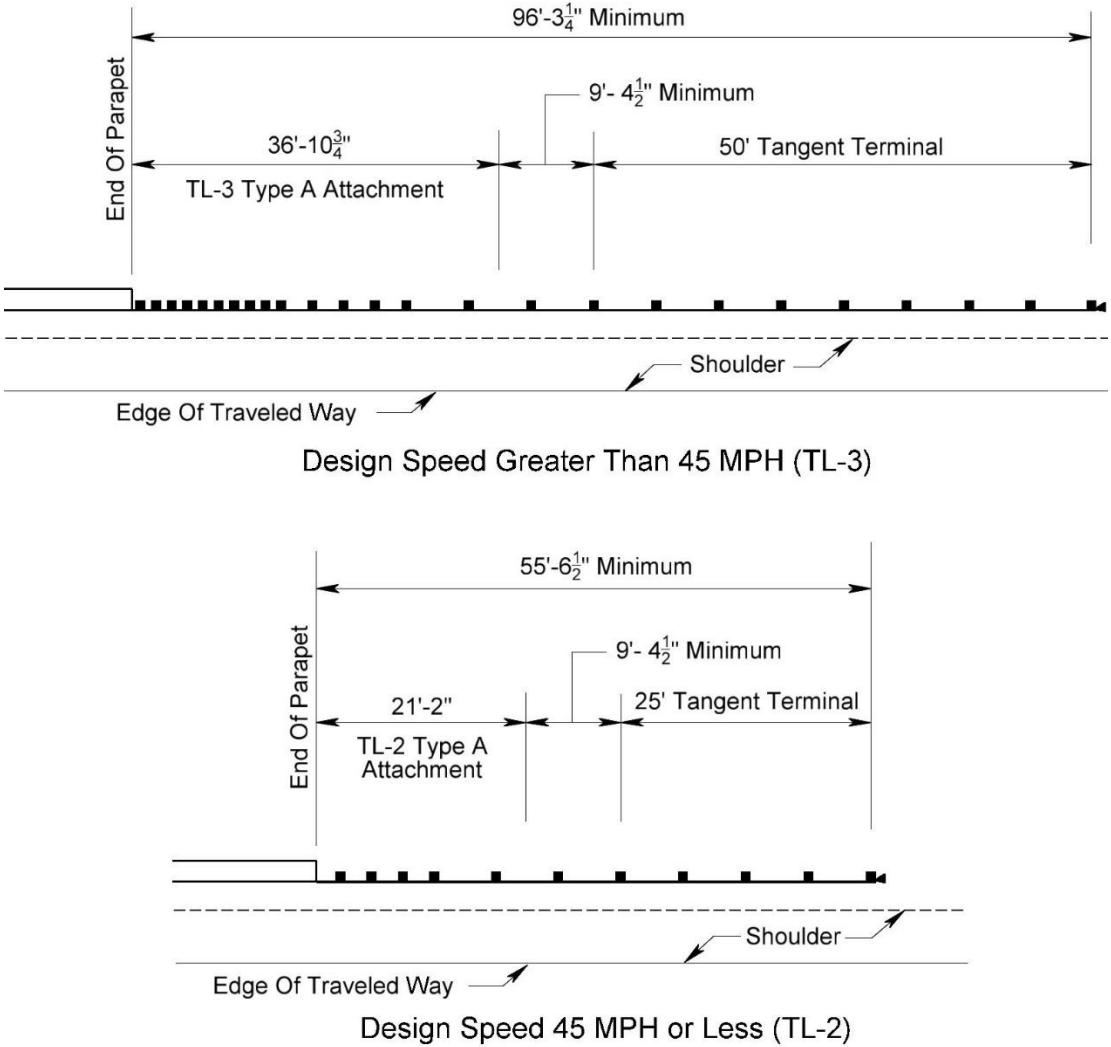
Minimum Length of W-Beam Guide Rail at a Type A Bridge Attachment
